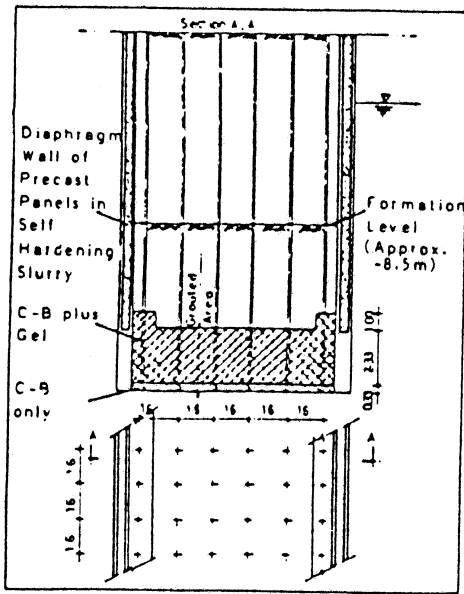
General Arrangement of Grouted Plug, Cairo Metro (Abdel Salam, 1984).
